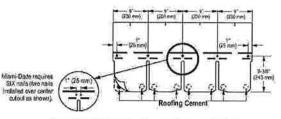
A: Use FTVE nails and eight spots of asphalt roufing cement under each lab corner.
